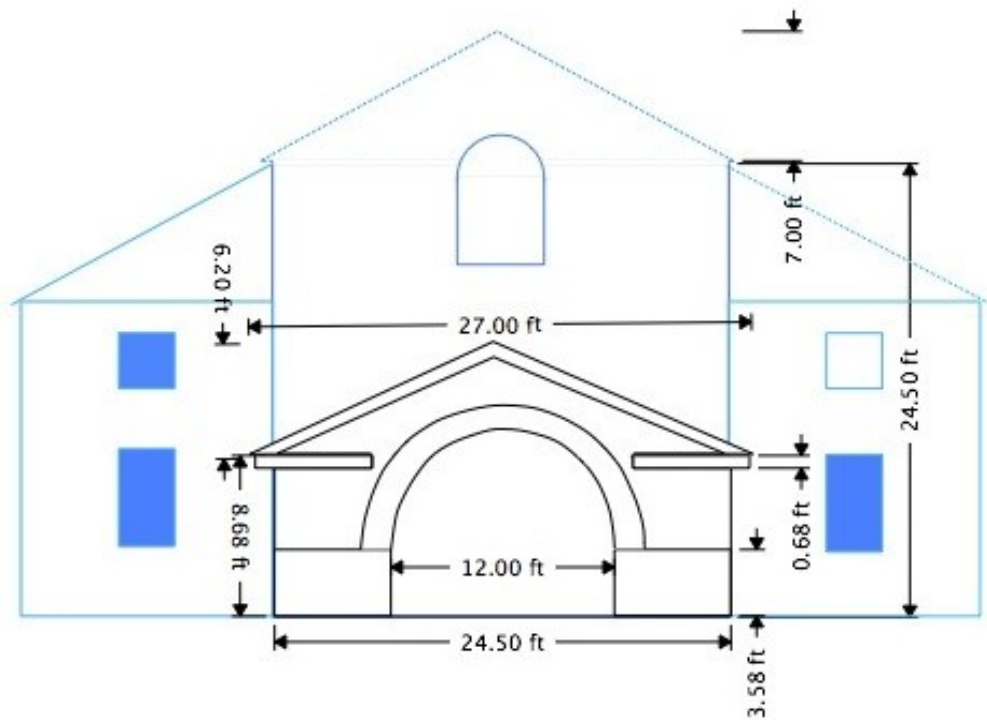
Sketch of north elevation, dotted = reconstruction, wheel house in black (JPGM 12/07)
